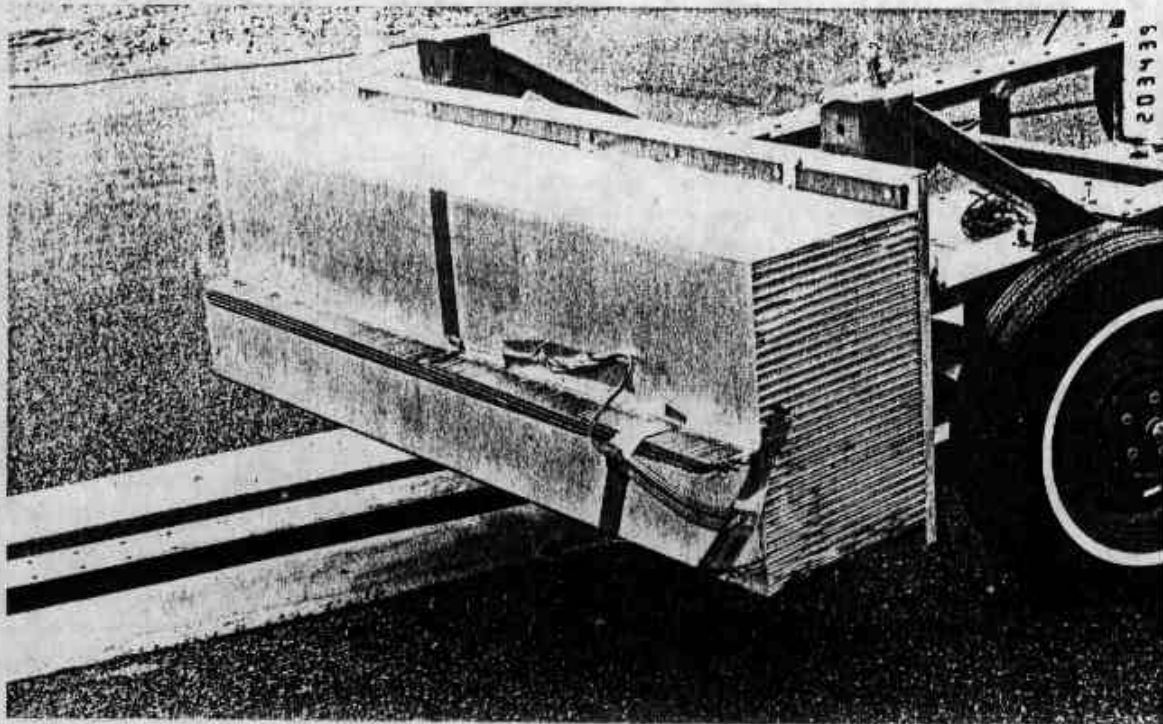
PRE-TEST LEFT SIDE VIEW OF BARRIER FACE.
